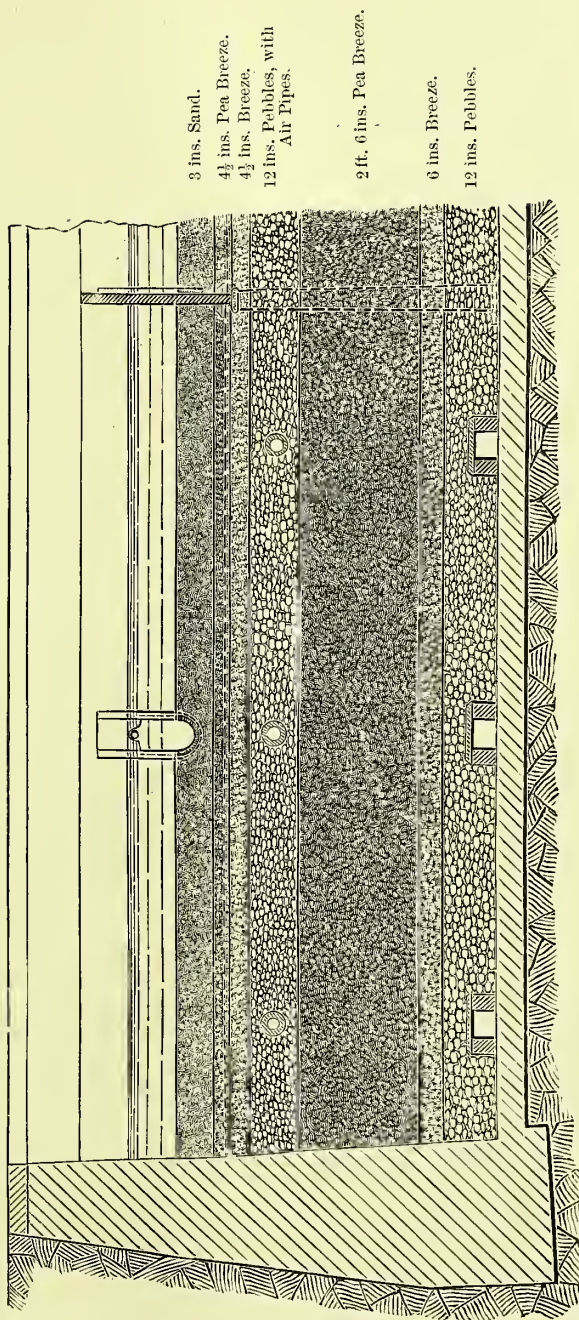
SECTION OF ONE DIVISION OF FILTER BED OF LOWCOCK'S FILTER. Scale ¼ inch to a foot.
